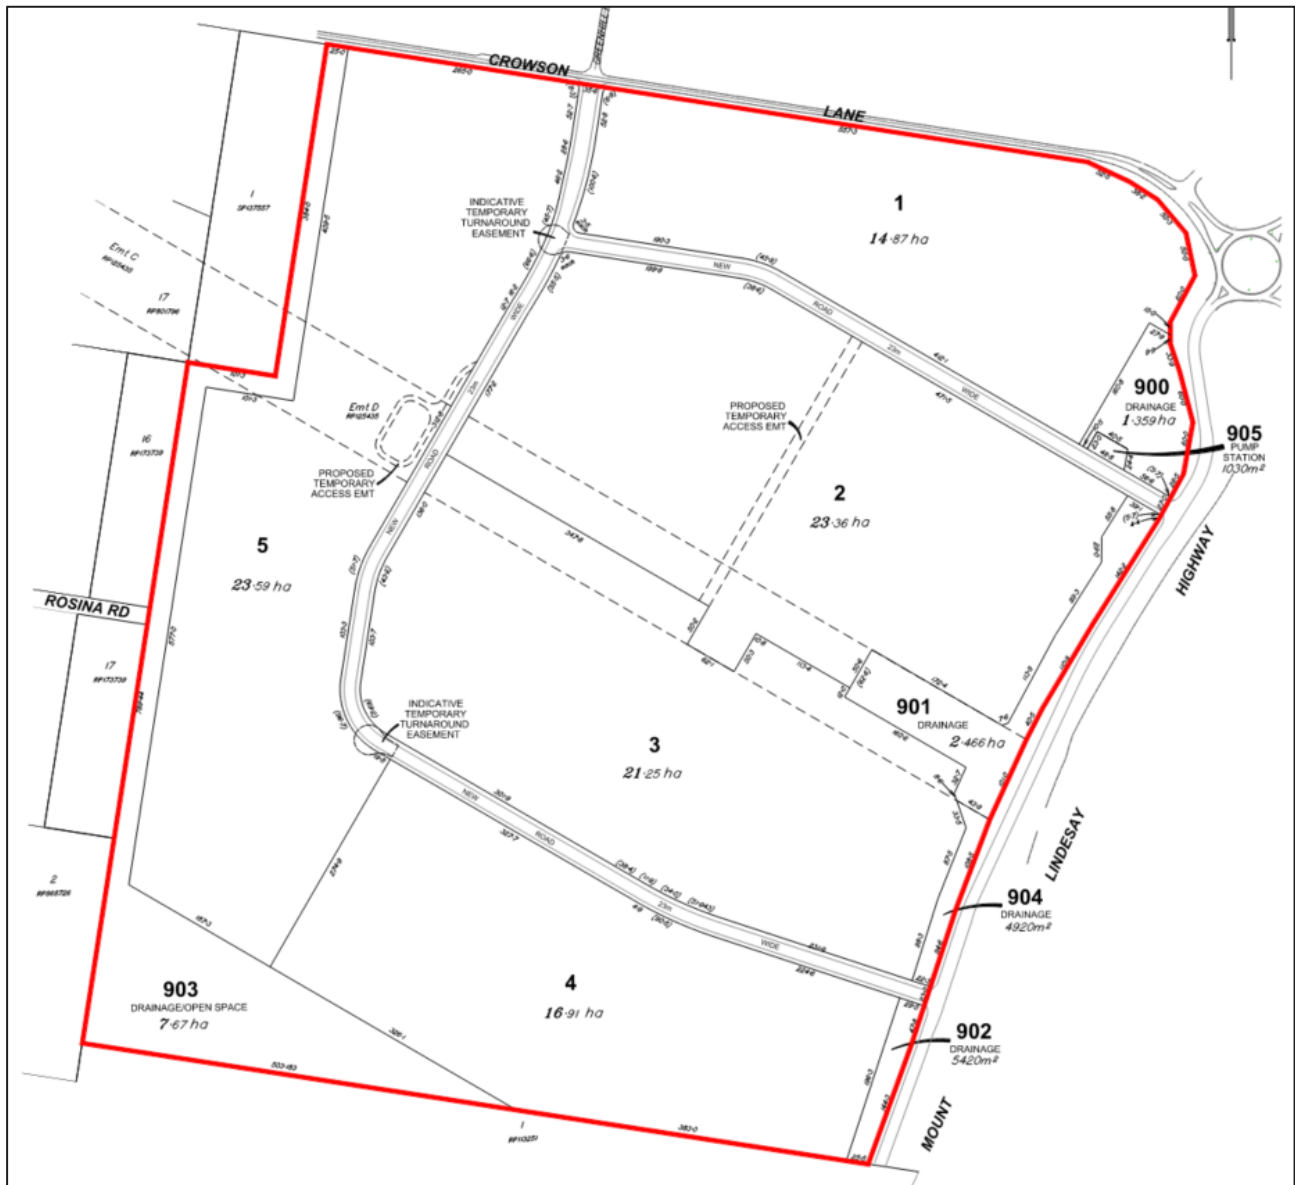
Proposed Amended ROL Layout (Source: Wolters, August 2023)
